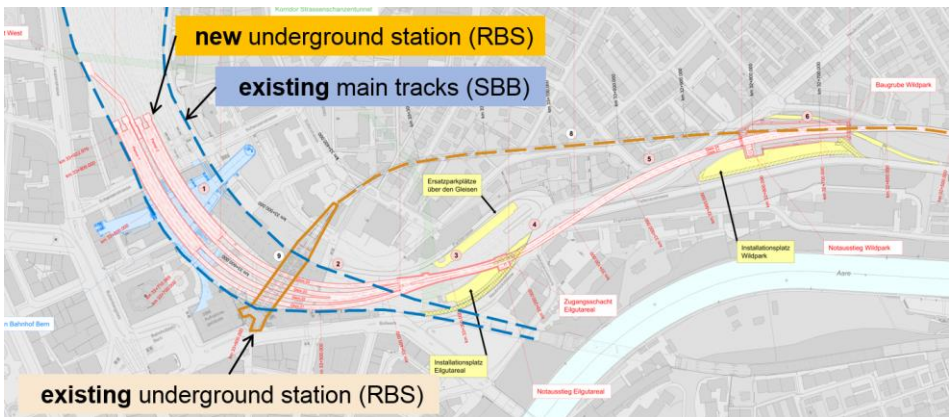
General plan of the new underground train station (RBS) underneath both the existing underground station (RBS) and the main station (SBB).
